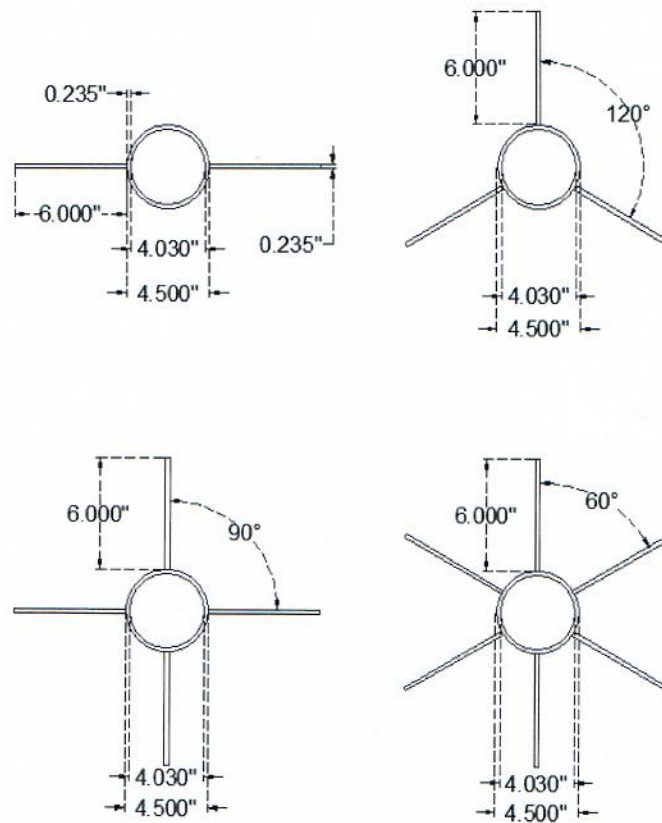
Location of Fins on Pipe Piles; 2, 3 4 and 6 Fins.
